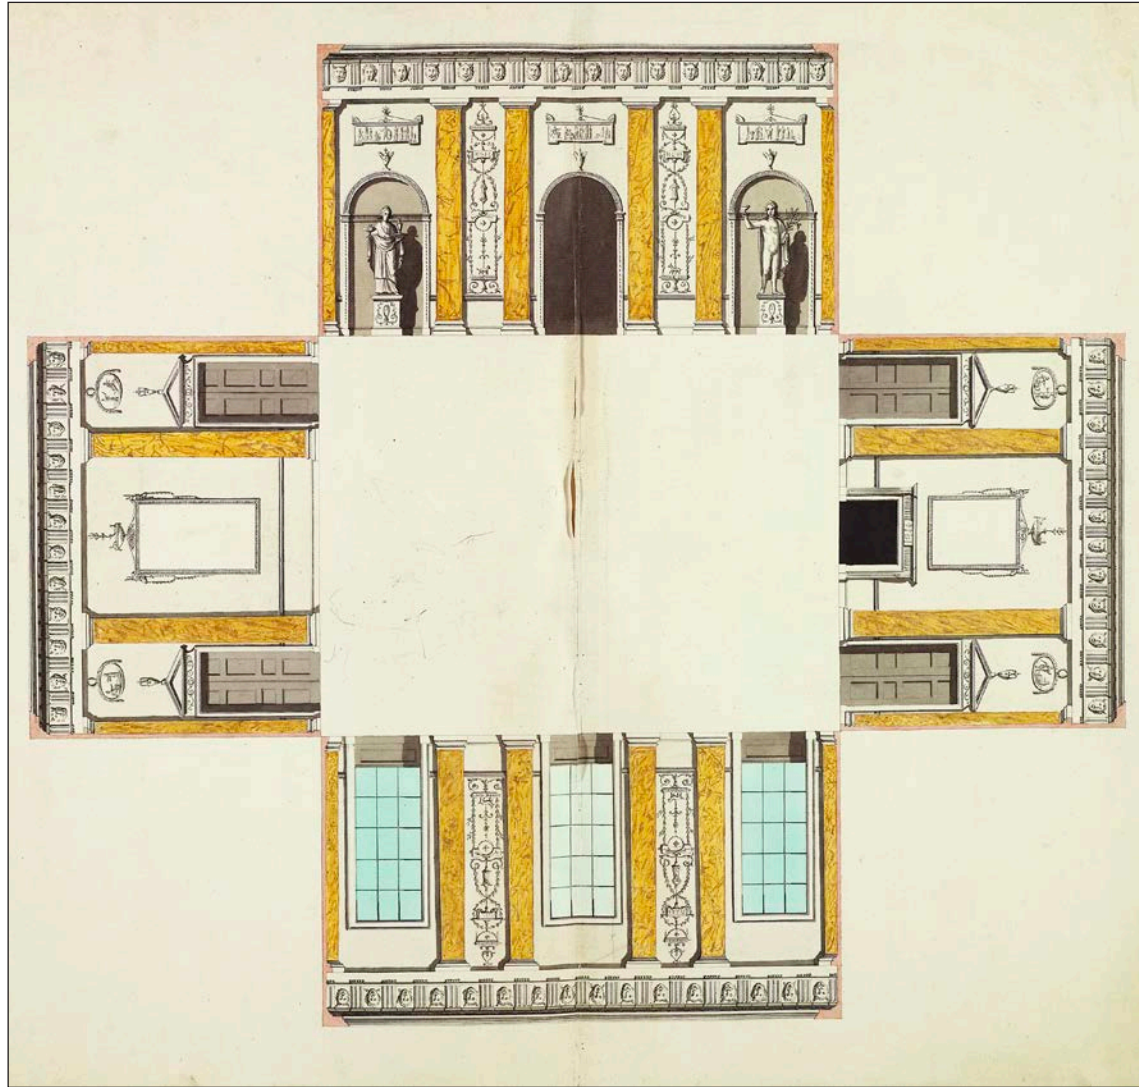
Interior design, laid-out elevations, Claremont House, Surrey, 1771.
